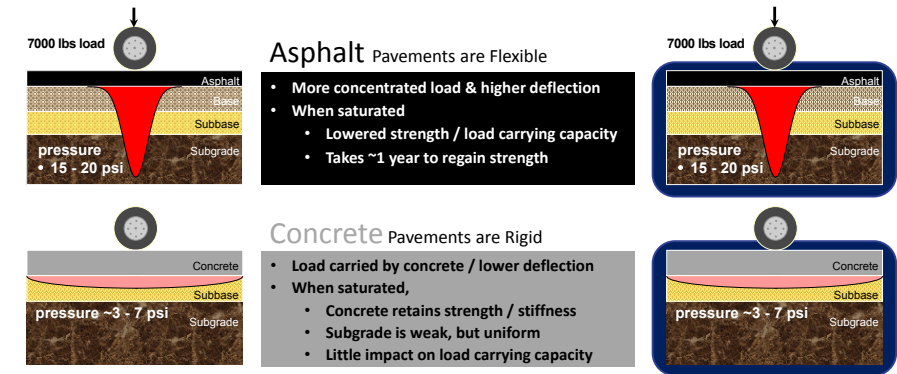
How Concrete and Asphalt Pavements Transmit Loads to The Subgrade and the Impacts when the Underlying Support Layers are Saturated.
